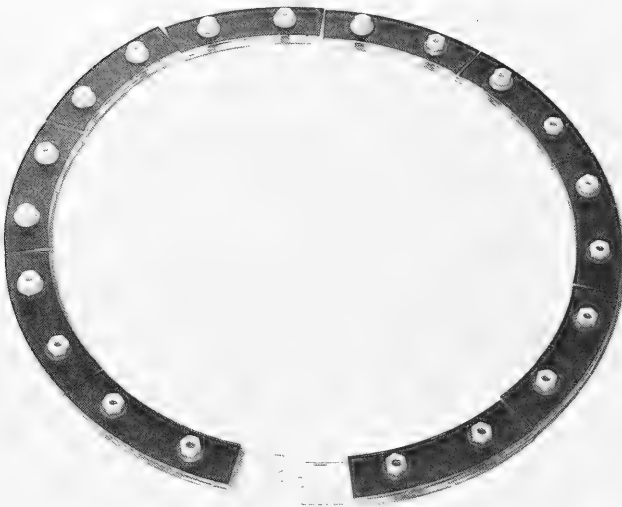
Segmented-wall model after failure at 220 psi of hydraulic loading.
